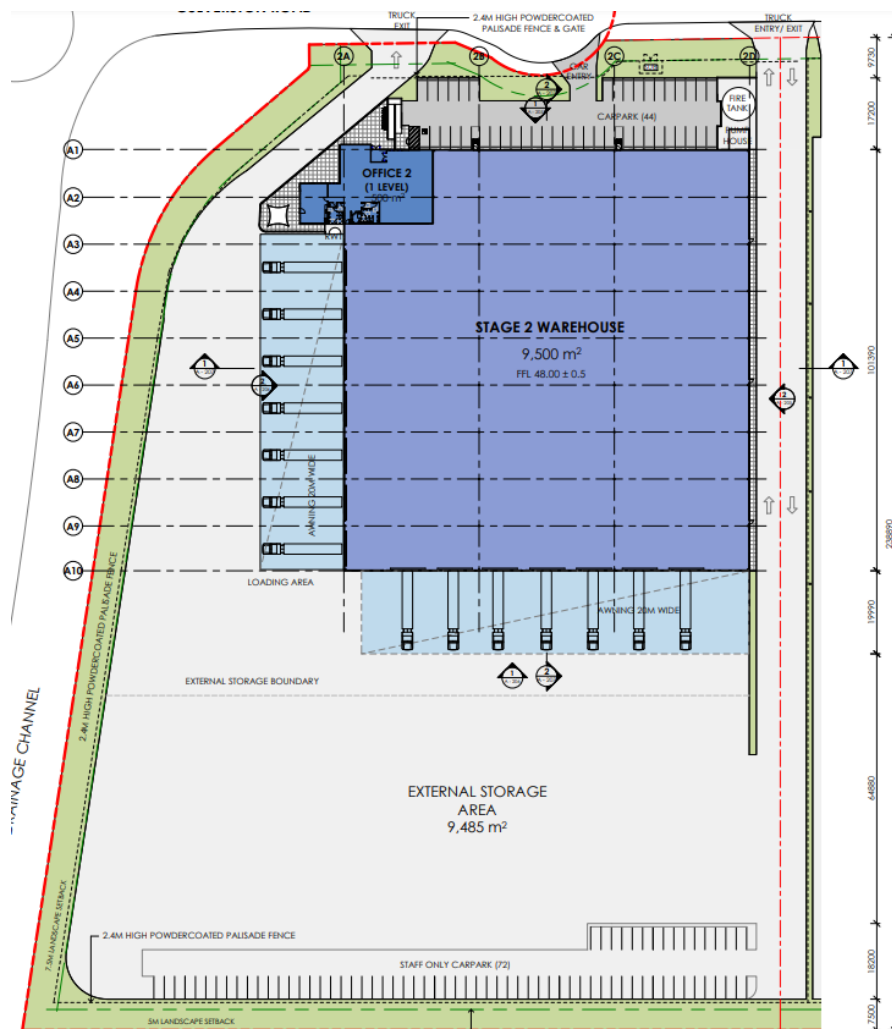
| Stage 2 Warehouse Site Plan, Approved, As Modified
